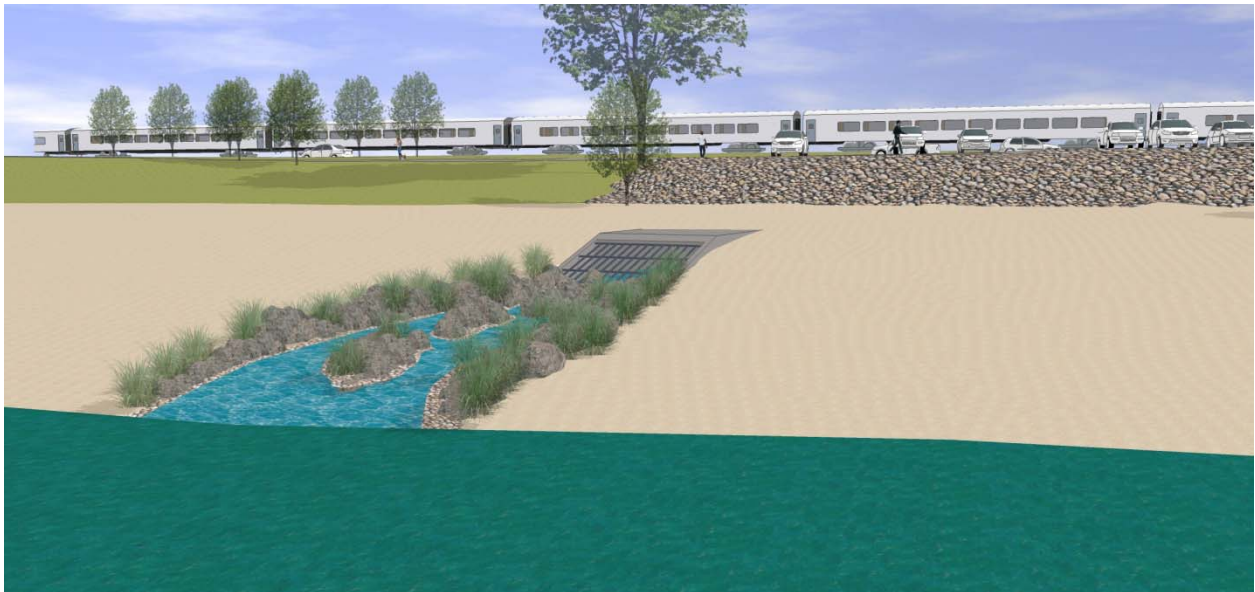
Ground plan view rendering of the T-3 outfall and natural stream
